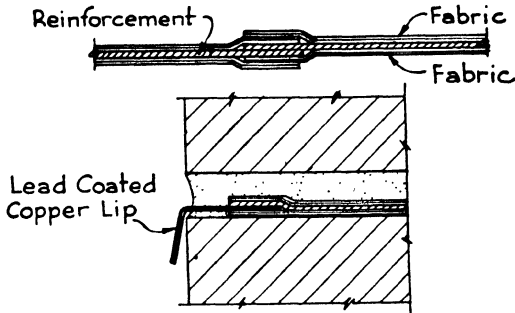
Lapping Reinforced Fabric Flashings.
